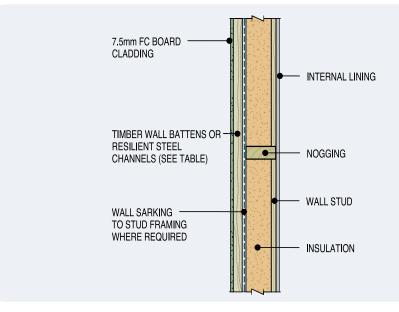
7.5 mm Fibre Cement Board (11 kg/m2) cladding. Vertical section through wall
